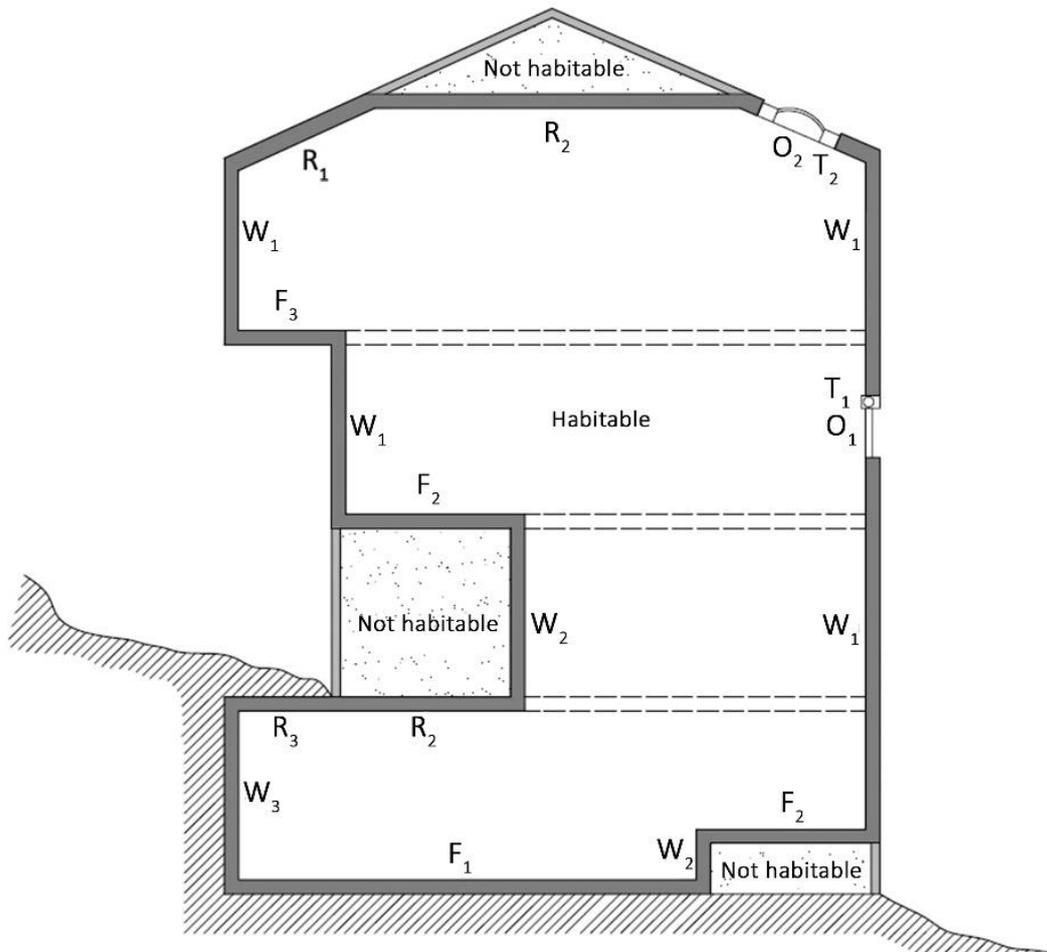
Composition of the thermal envelope of a building: Vertical external walls (W); Horizontal roofs (R); Floors (F); Openings (O); and Thermal bridges (T) (RD 314/2006).
